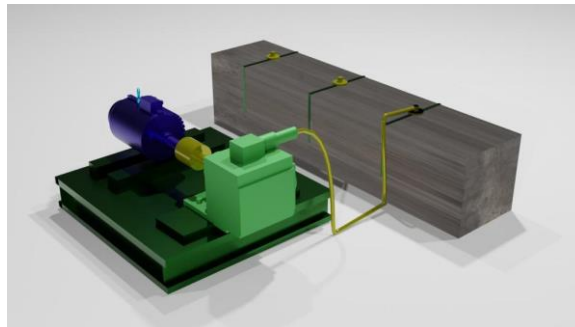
General crack injection schematics in the models and technique for injecting cracks
